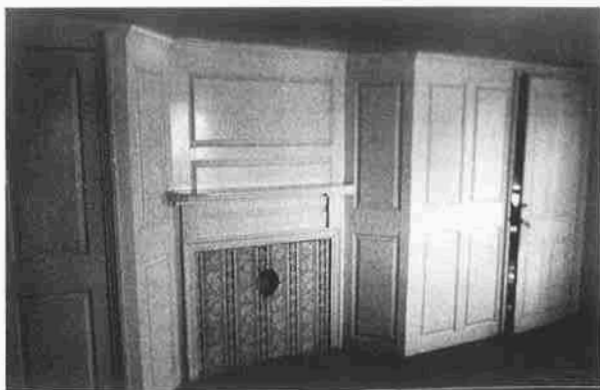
The central chimney was replaced with a smaller one, but the original fireplace wall paneling was retained (although the mantel shelf is a later addition). This room was originally on the first floor.
